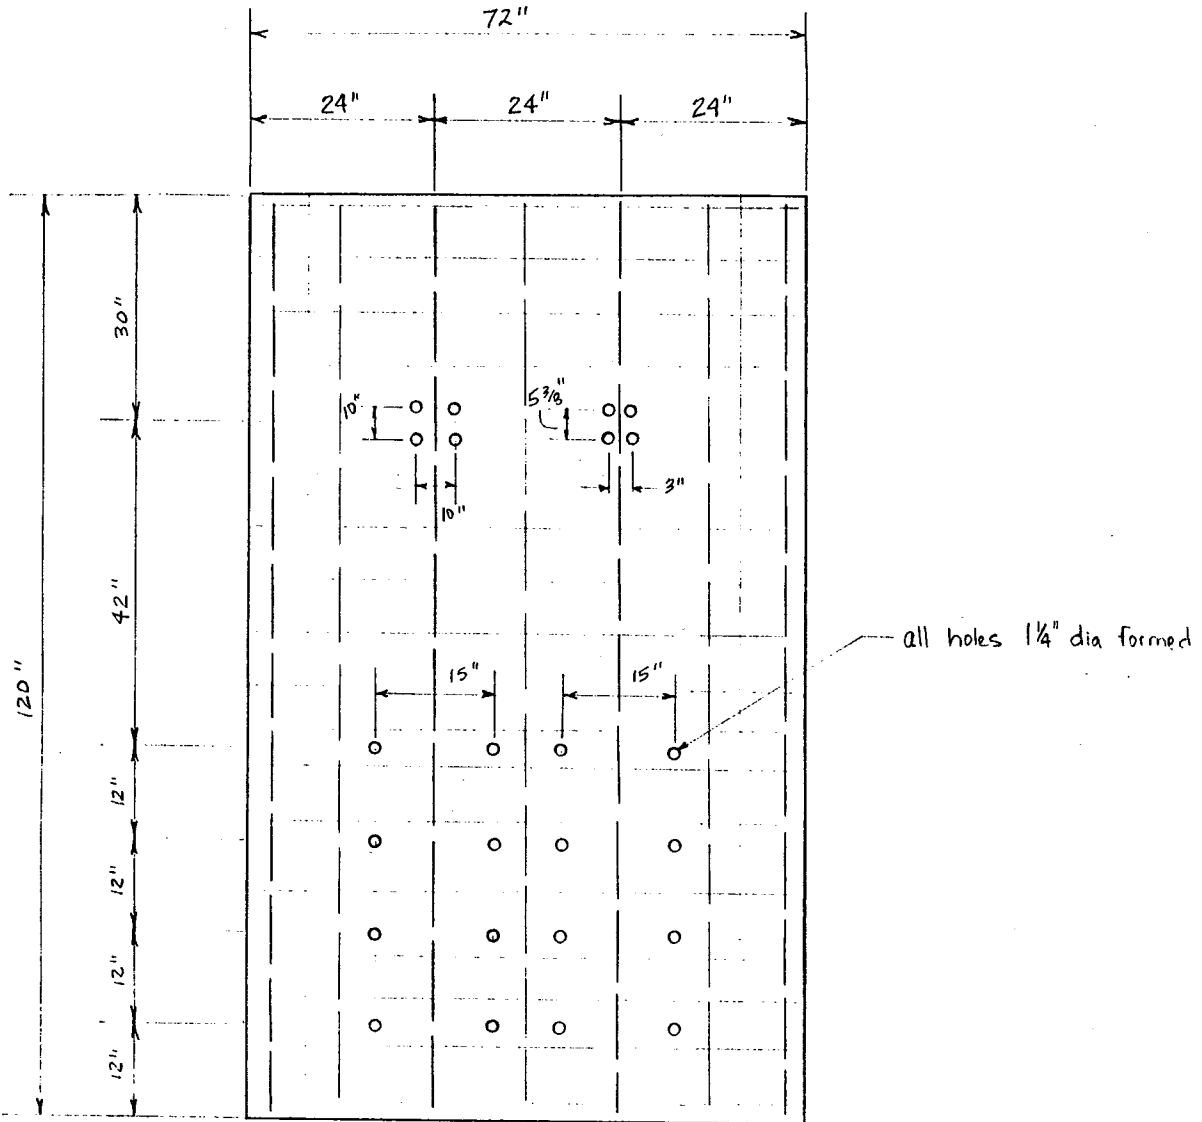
SUMMARY OF SIMULATED CULVERT SLAB REINFORCEMENT
